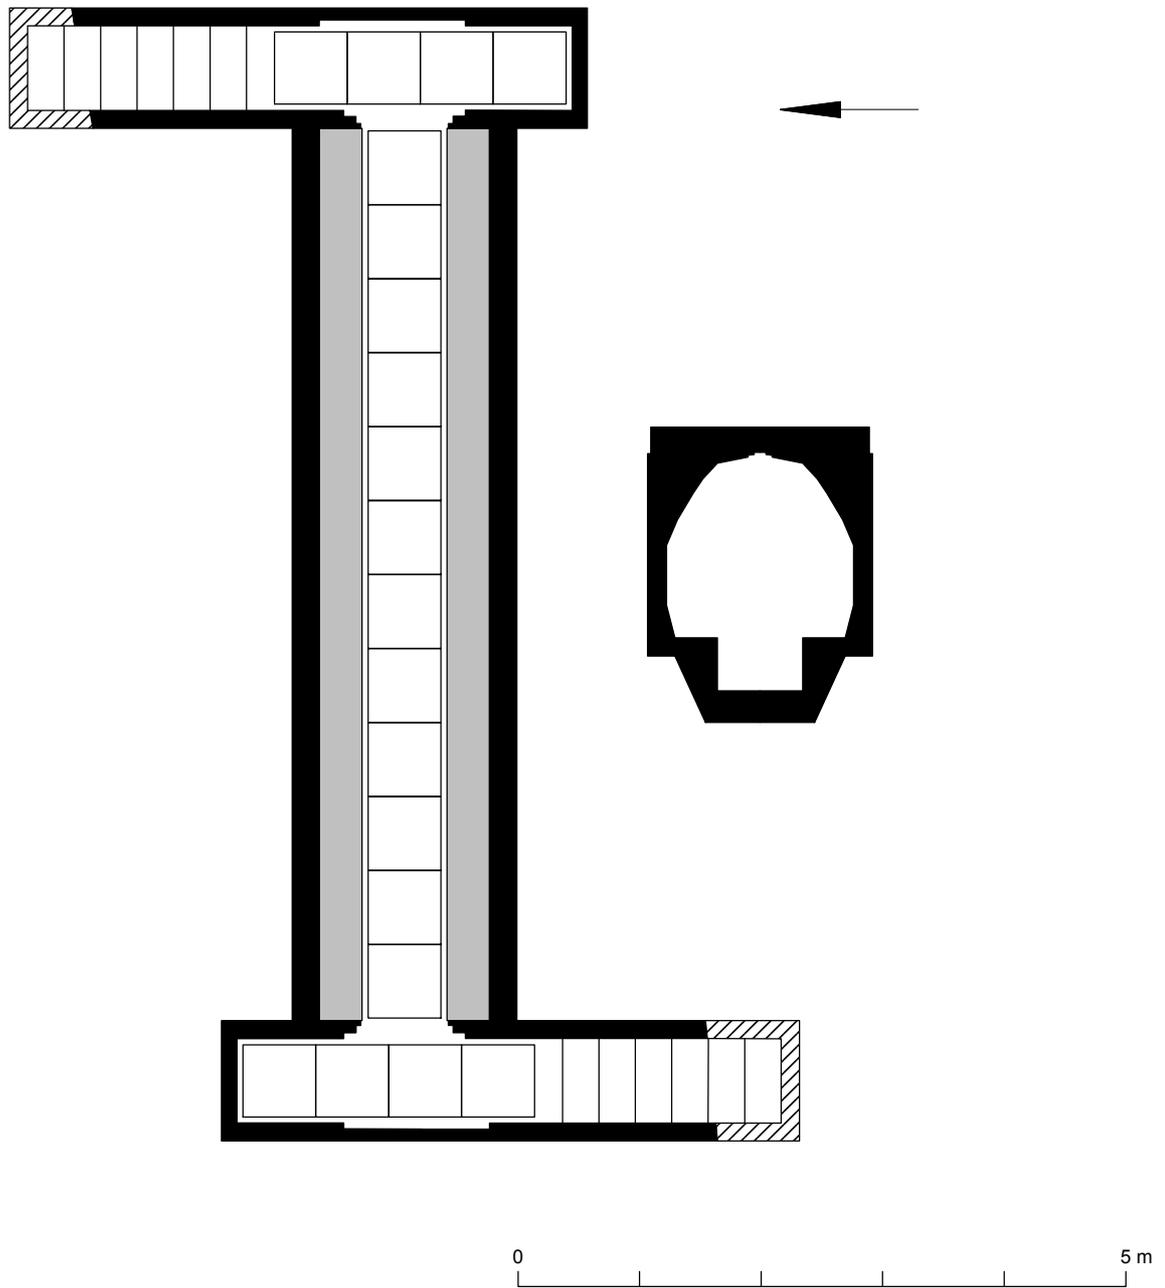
Development Area 7: air-raid shelter WBF103 - plan and cross-section.
